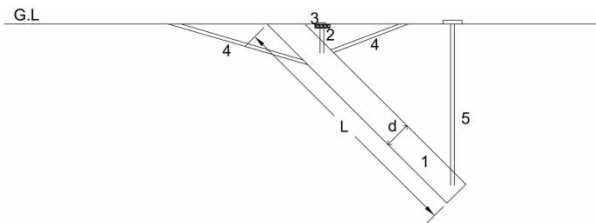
| Rainwater harvesting in directional tunnel. 1 – Water storing directional tunnel 2 – Inlet pipe from runoff 3 – Water filter at runoff inlet 4 – Multiple inlets from individual household tanks 5 – Outlet pipe. L – Length of the directional tunnel, d – diameter of the directional tunnel.
